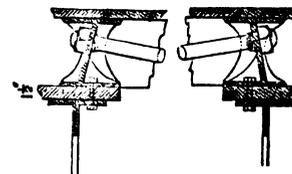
Details of Elevation of Truss of Gallery Floor.
